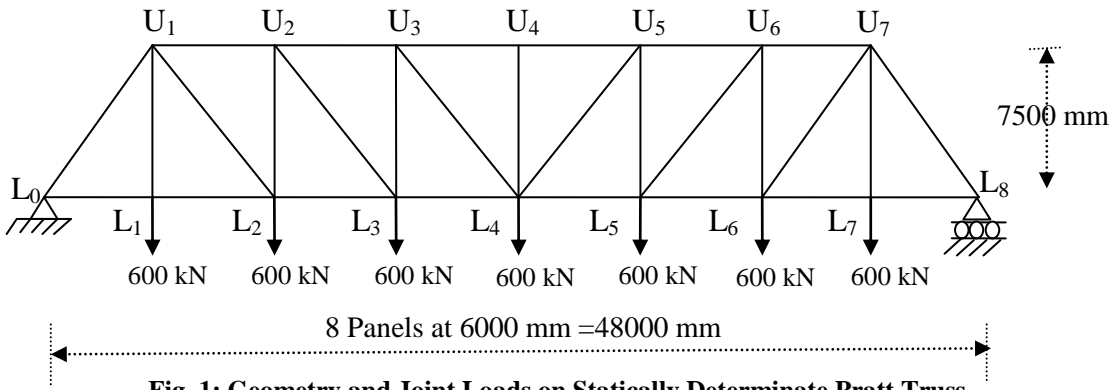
Geometry and Joint Loads on Statically Determinate Pratt Truss
